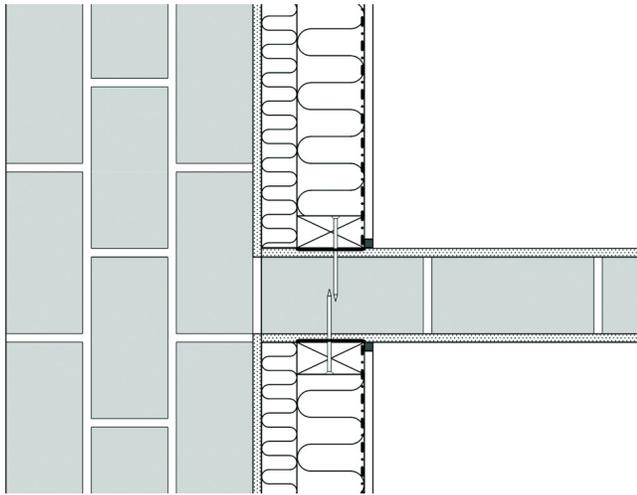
Horizontal section of the connection of the interior wall of brick to the existing exterior wall after post-insulation. The timber frame was kept clear of the exterior wall. The airtight shell was established by a 0.2 mm polyethylene foil that also served as the vapor barrier. It was crucial that the foil had airtight joints and was securely fixed to the interior wall.
